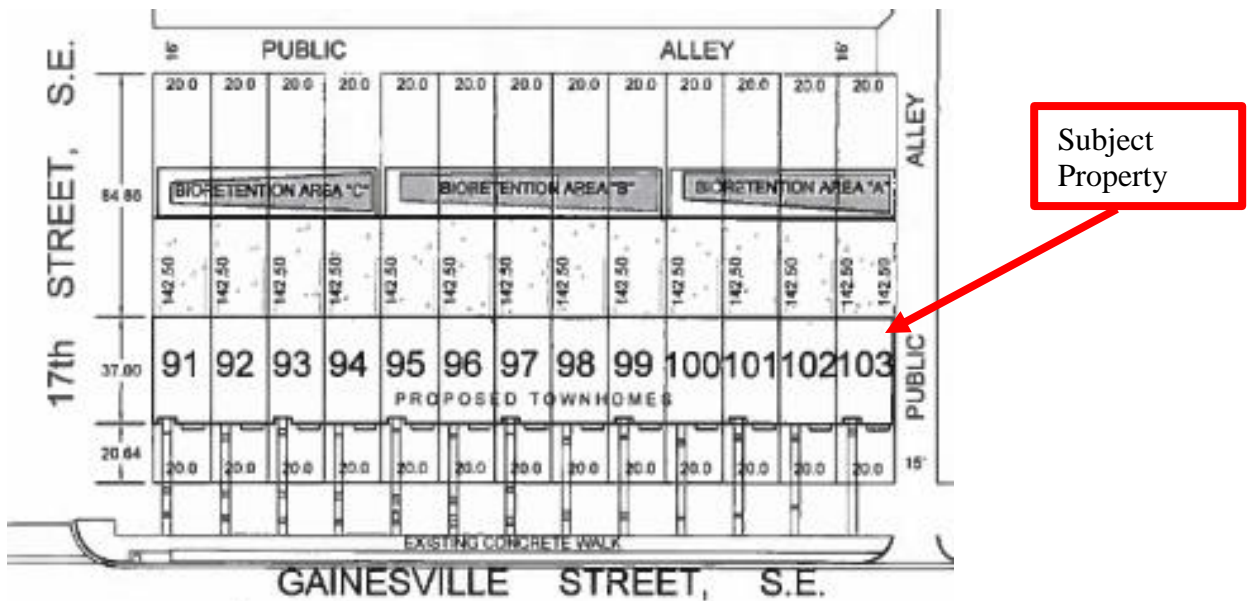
Approved Subdivision Plan for 1700-1724 Gainesville ST. SE
